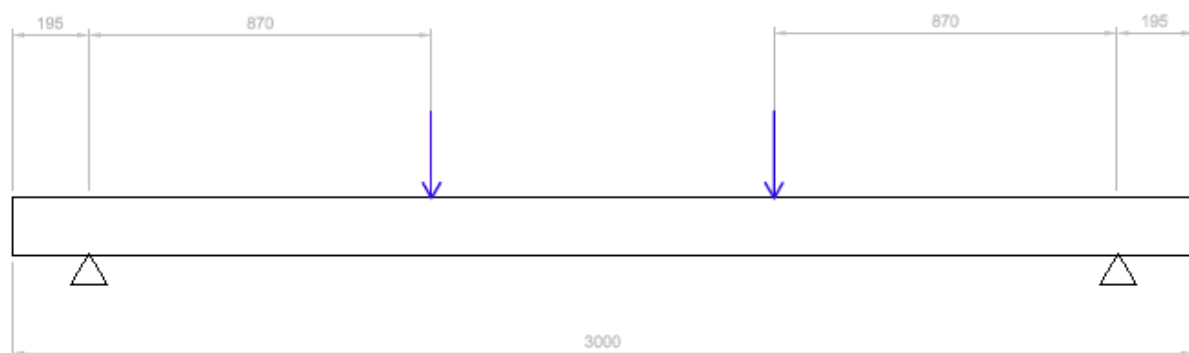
Timber deck with two applied loads. The loads are marked with two arrows. The distance between the two loads was 870mm. The view is a section of the SLTD of 3000mm pre-stressed with 10 steel bars.
